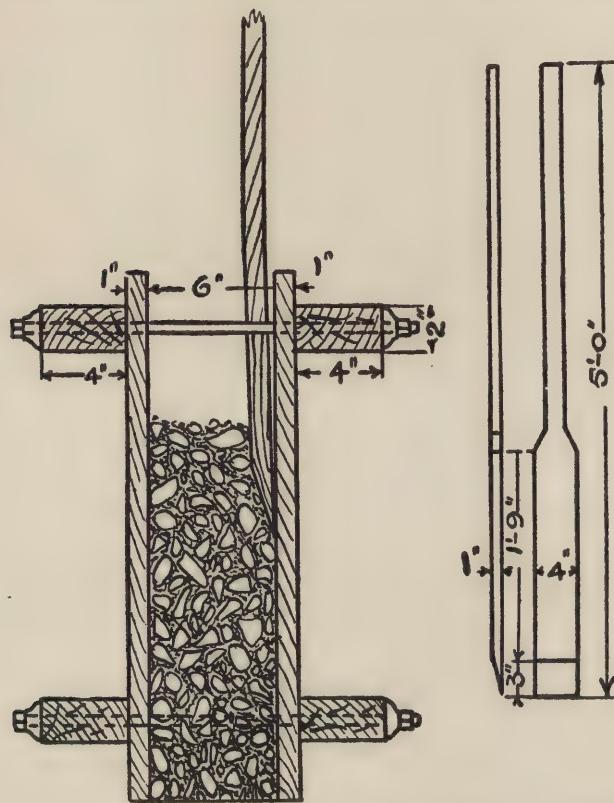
Diagram Showing Method of Spading a 6-Inch Concrete Wall.
